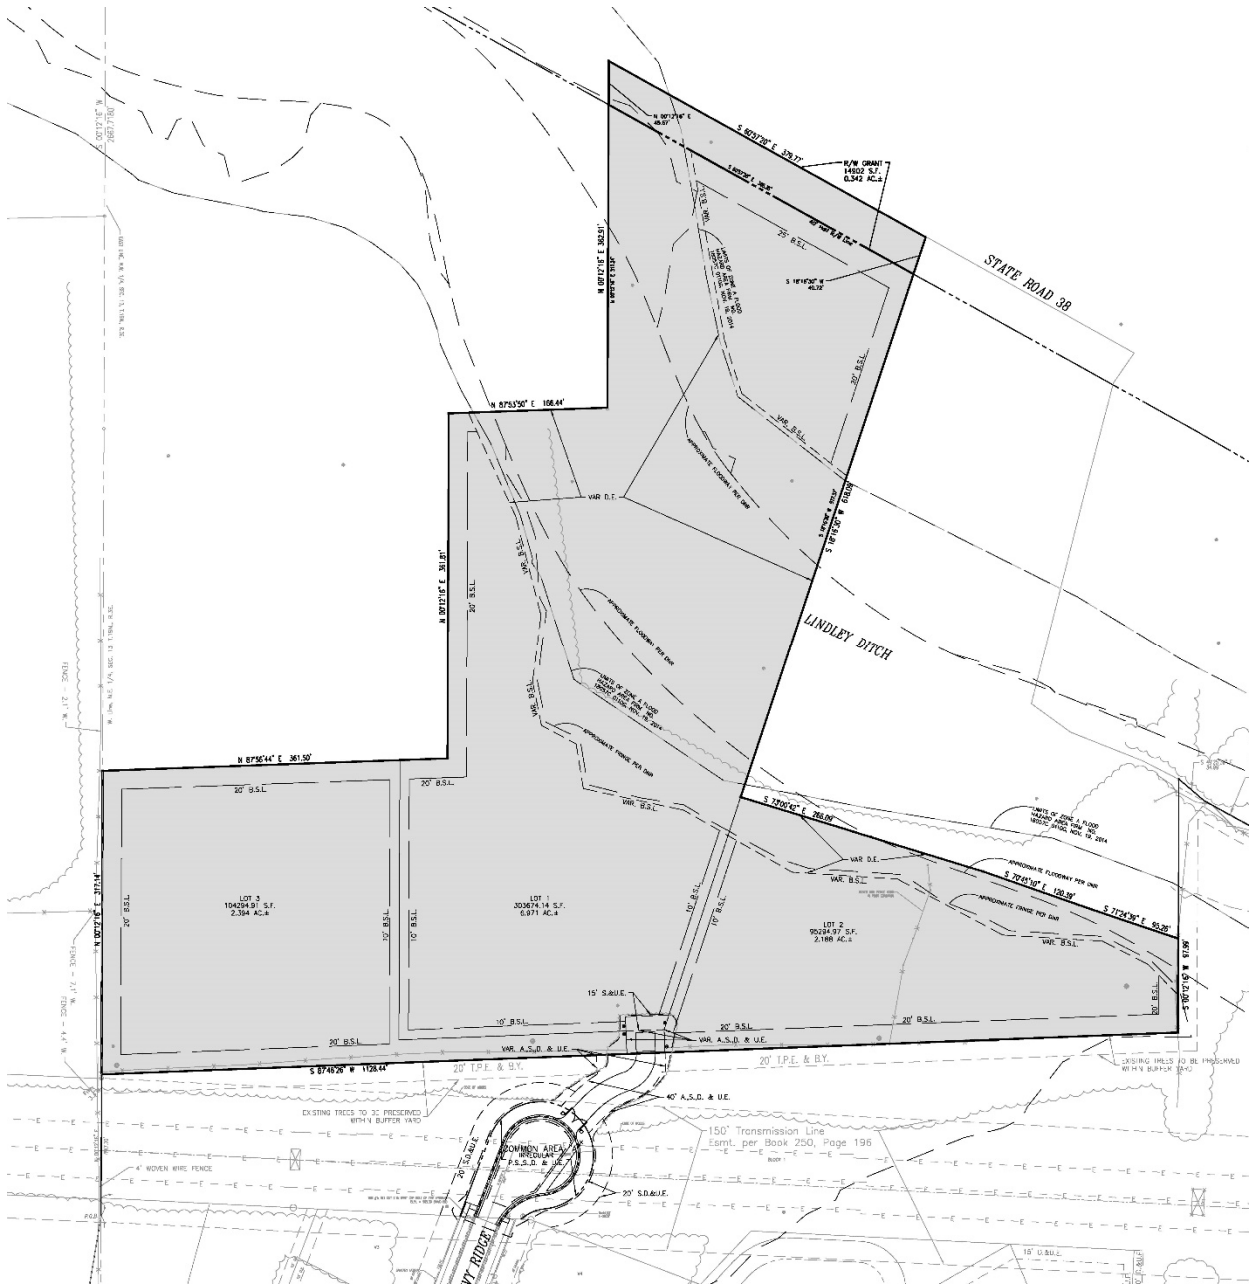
EXHIBIT B CONCEPT PLAN (Page 1 of 1)
